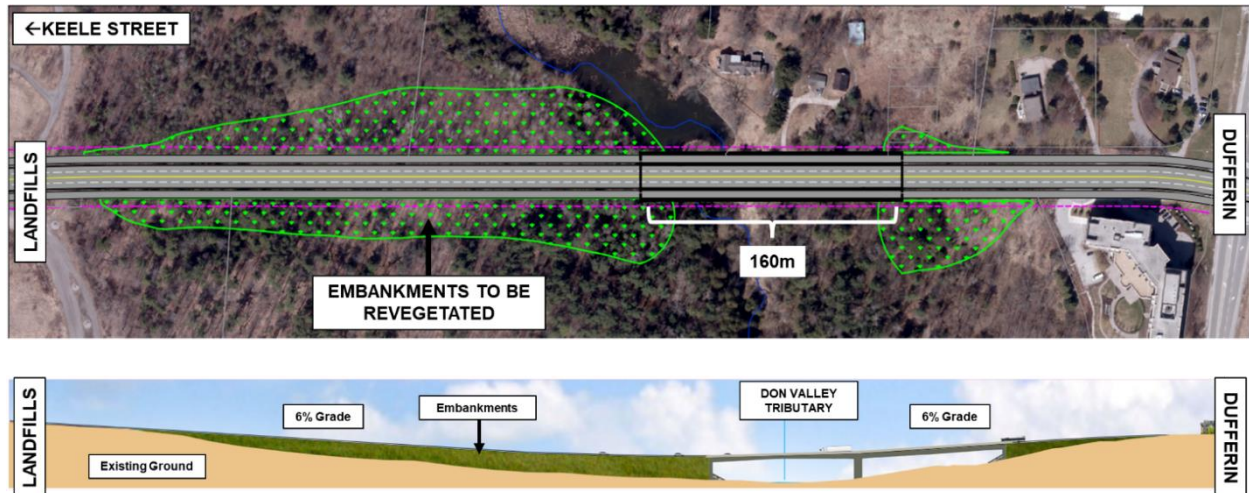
Section 3, Alternative 2: Double Span Bridge
